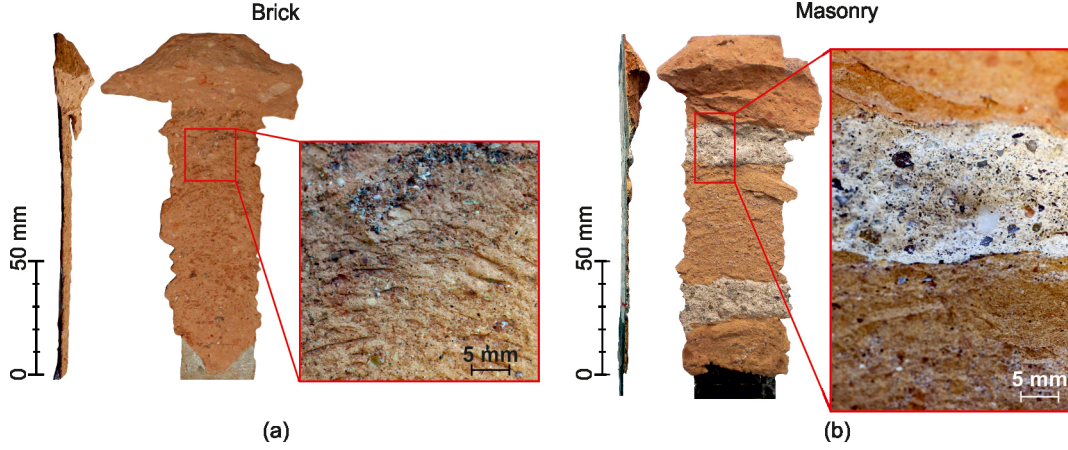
Type-1 failure observed for specimens built up with A-series bricks: (a) brick specimen A-1; (b) masonry specimen MA-3.
